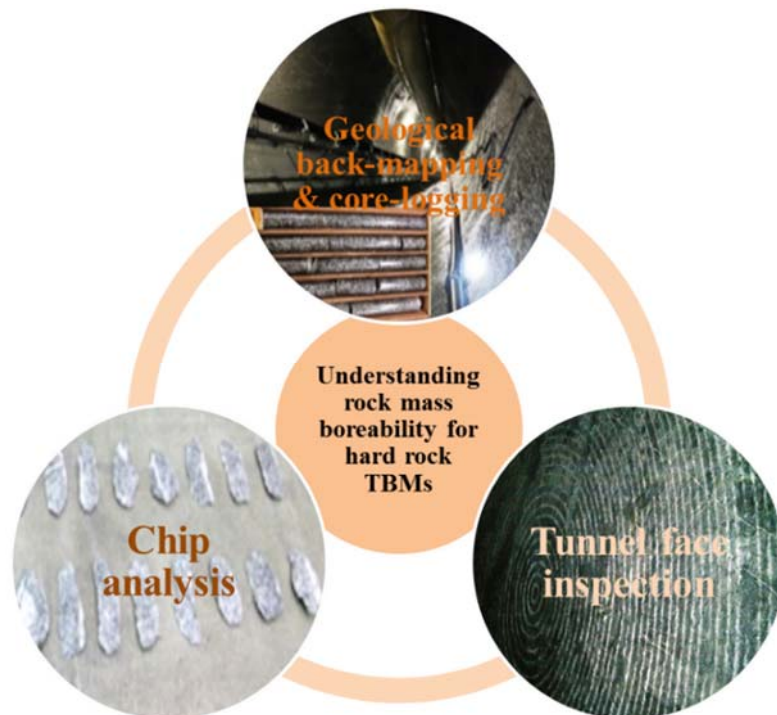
Schematic outlining different approaches to the understanding of rock mass boreability in connection with hard rock TBM tunnelling (Macias, 2016).
